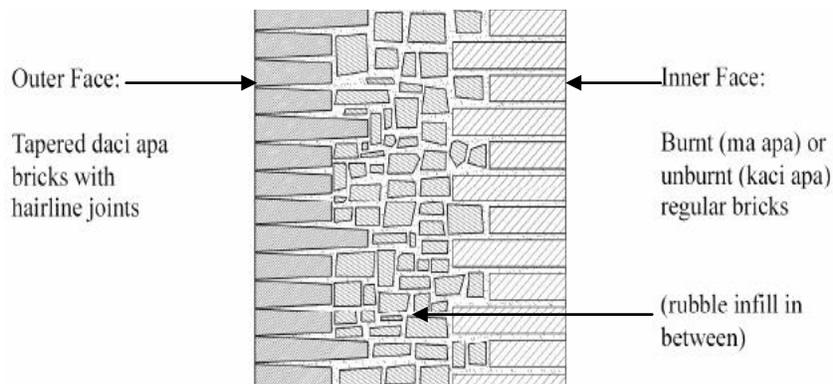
Three layers in a typical brick masonry wall in Nepal (source: Beckh, 2006).
